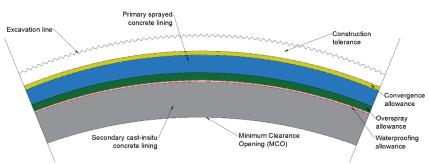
Cross passage excavation and primary lining tolerances
